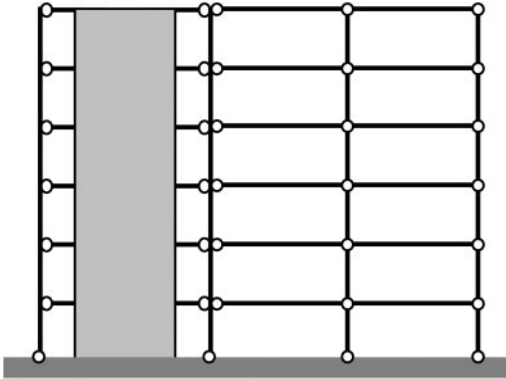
Example of innovative hybrid coupled shear wall system connected to a gravity-resisting steel frame with pinned beam-to-column joints.
